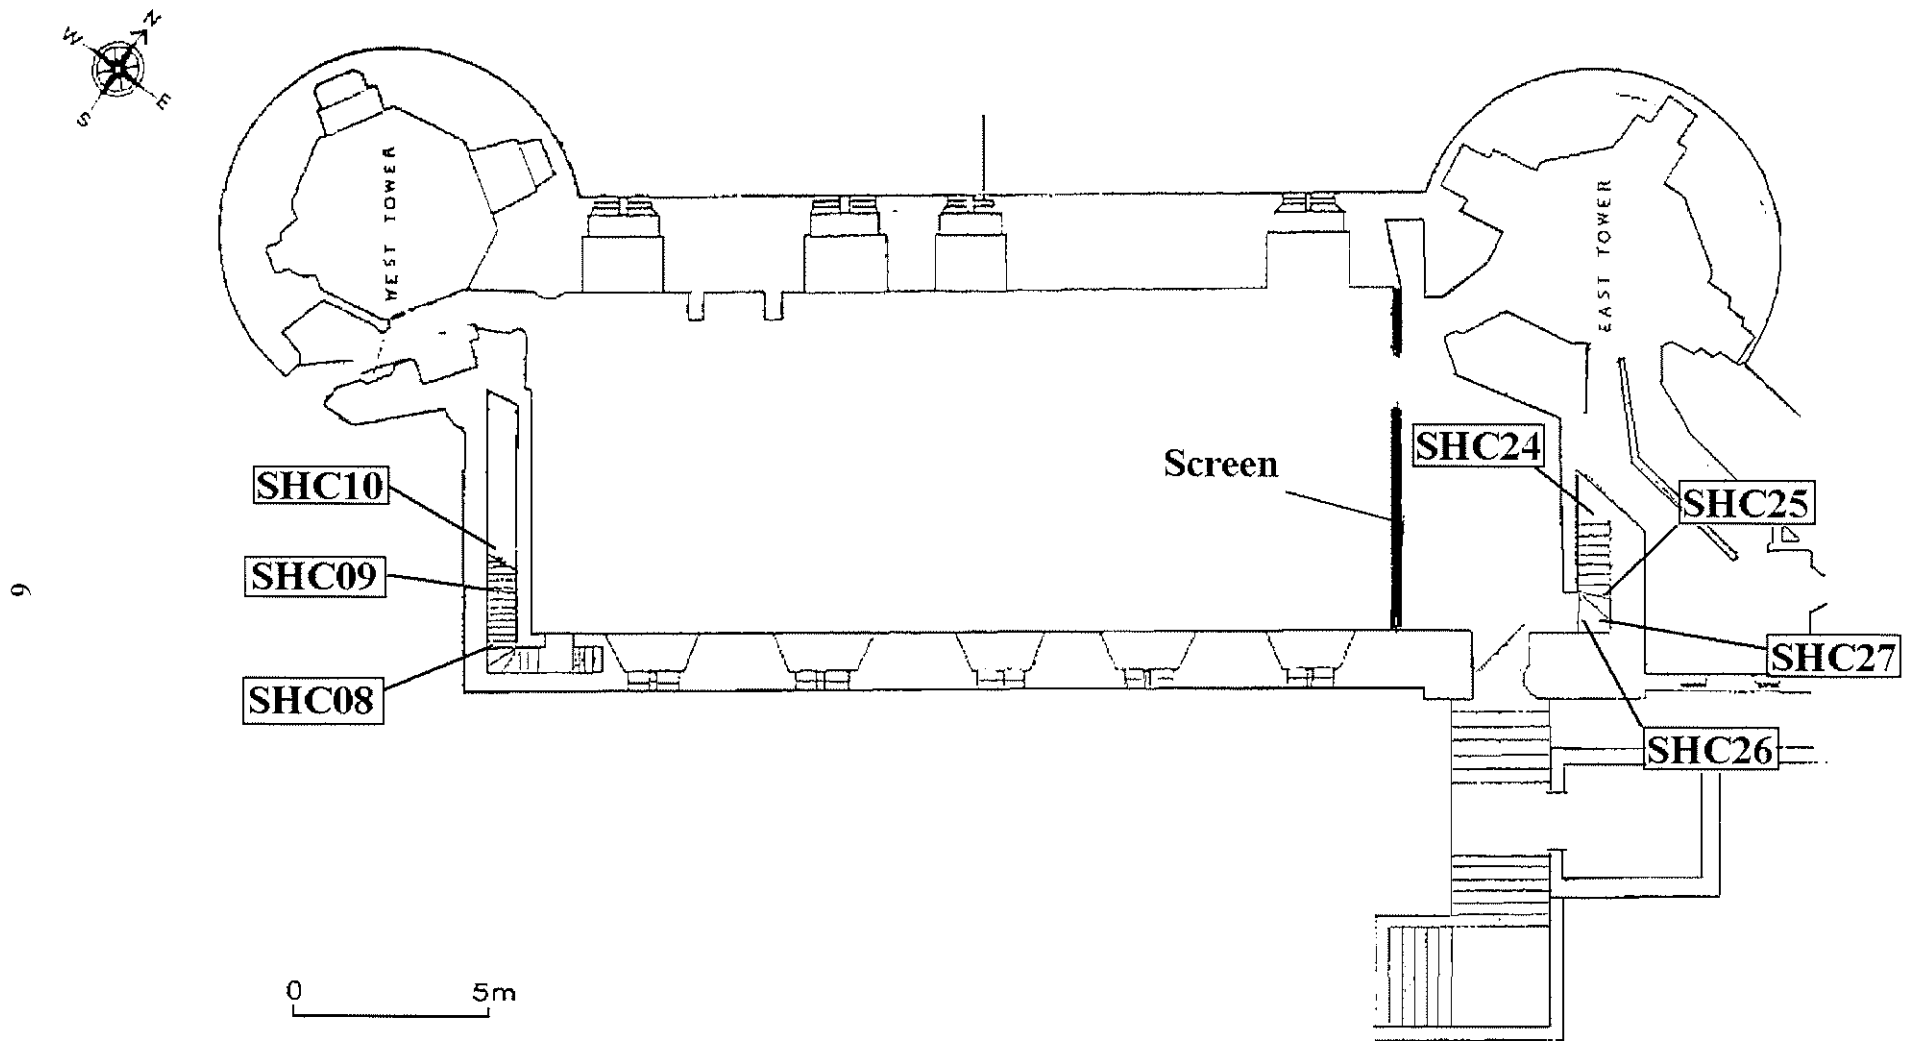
Ground-floor plan of the Hall range, showing the timbers sampled for dendrochronology, adapted from an original drawing in Morriss (2001 unpubl, fig 6)
